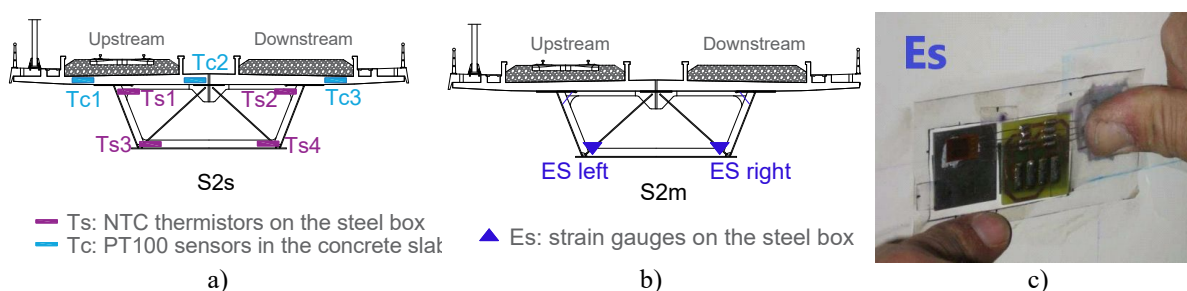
Bridge cross section: NTC thermistors in the steel box (Ts) and PT100 sensors in the concrete slab (Tc), b) strain gauges on the steel box (Es), c) electric strain gauge (Es) installation.
